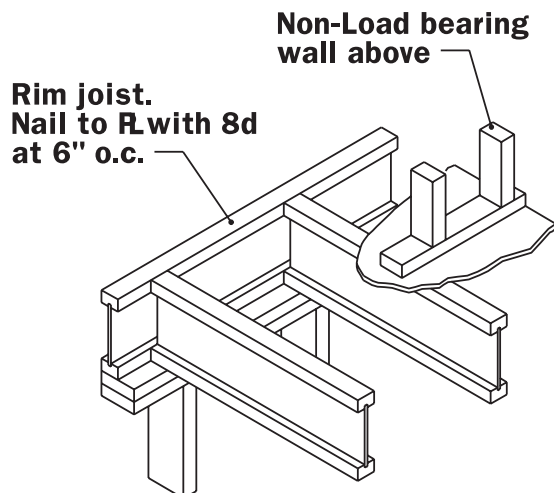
Vertical Wall Offset on I-Joist Floor Assembly
